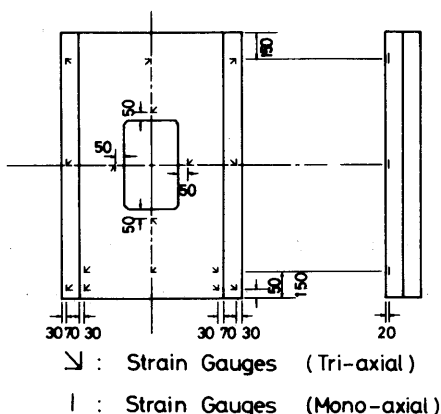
STRAIN GAUGE LOCATIONS OF TEST GIRDERS
